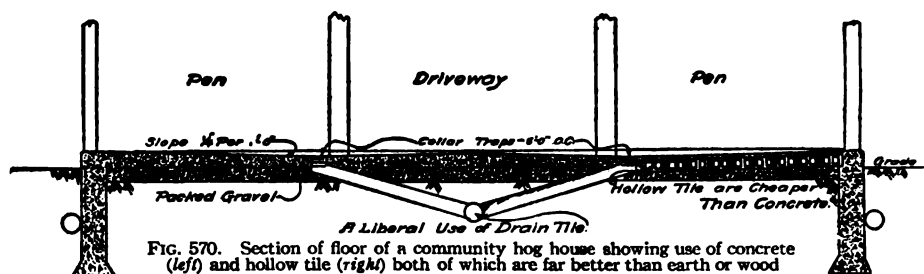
Section of floor of a community hog house showing use of concrete (left) and hollow tile (right) both of which are far better than earth or wood
